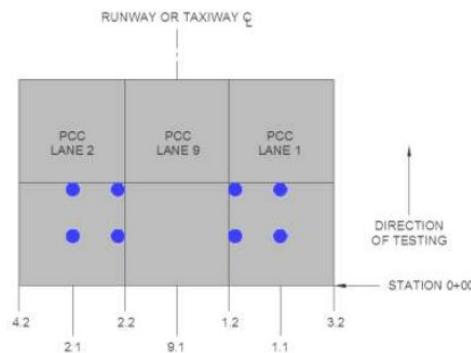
Example Runway or Taxiway Sketch When Centerline Does Not Lie on Slab Joint
